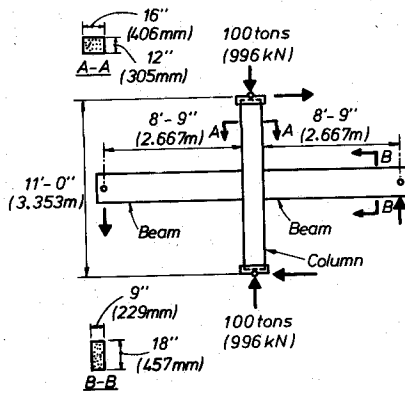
Dimensions and loading of beam-column test units (References 3 and 6).
